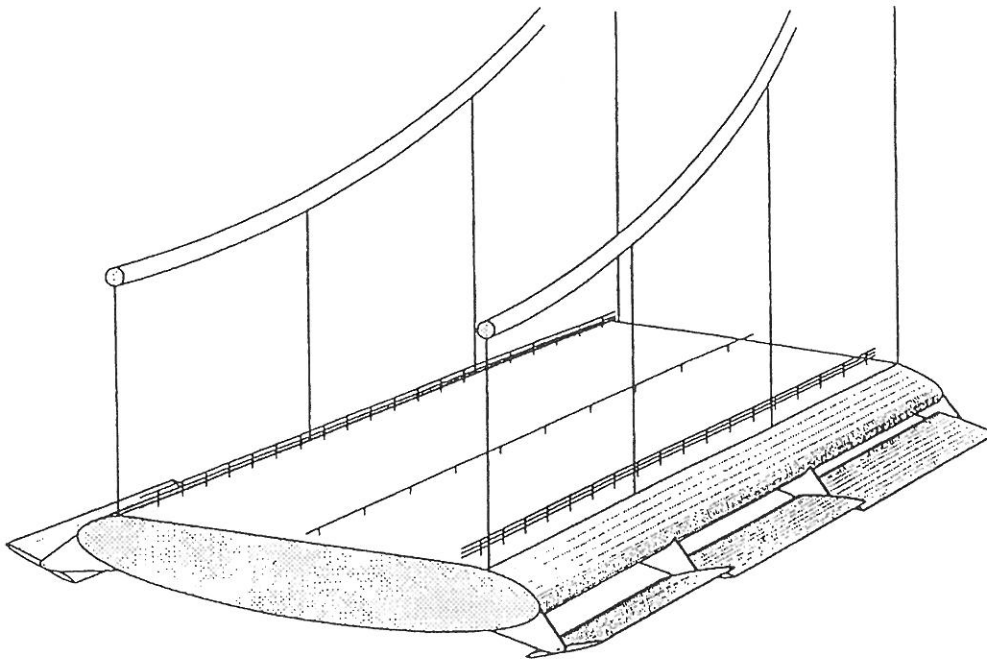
Flaps arranged on pylons under bridge girder [1].
